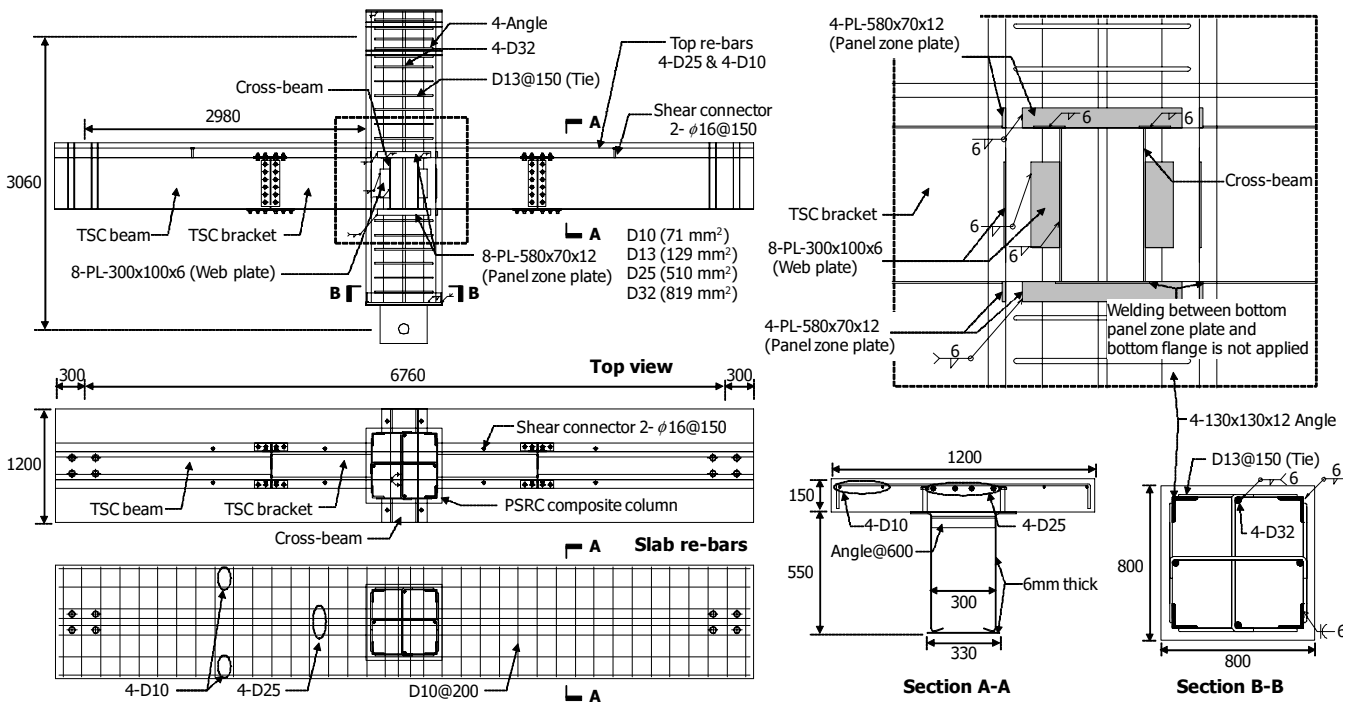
Details of interior and exterior TSC composite beam-to-PSRC composite column connections
